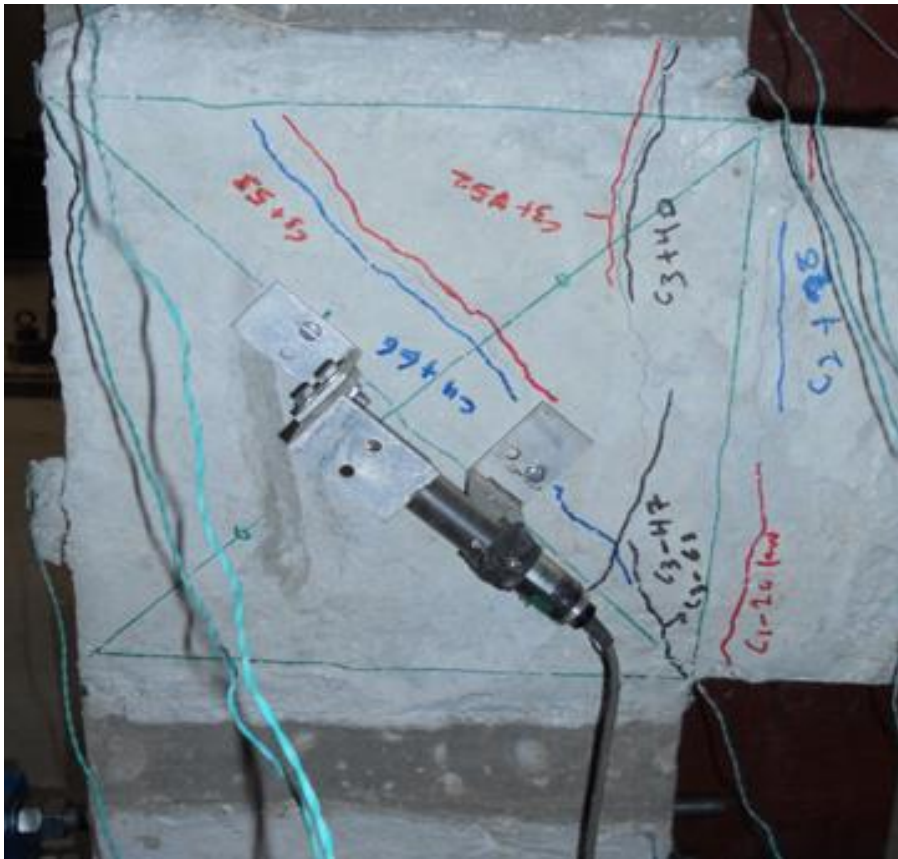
Position of LVDT J1 in joint to observe diagonal crack
